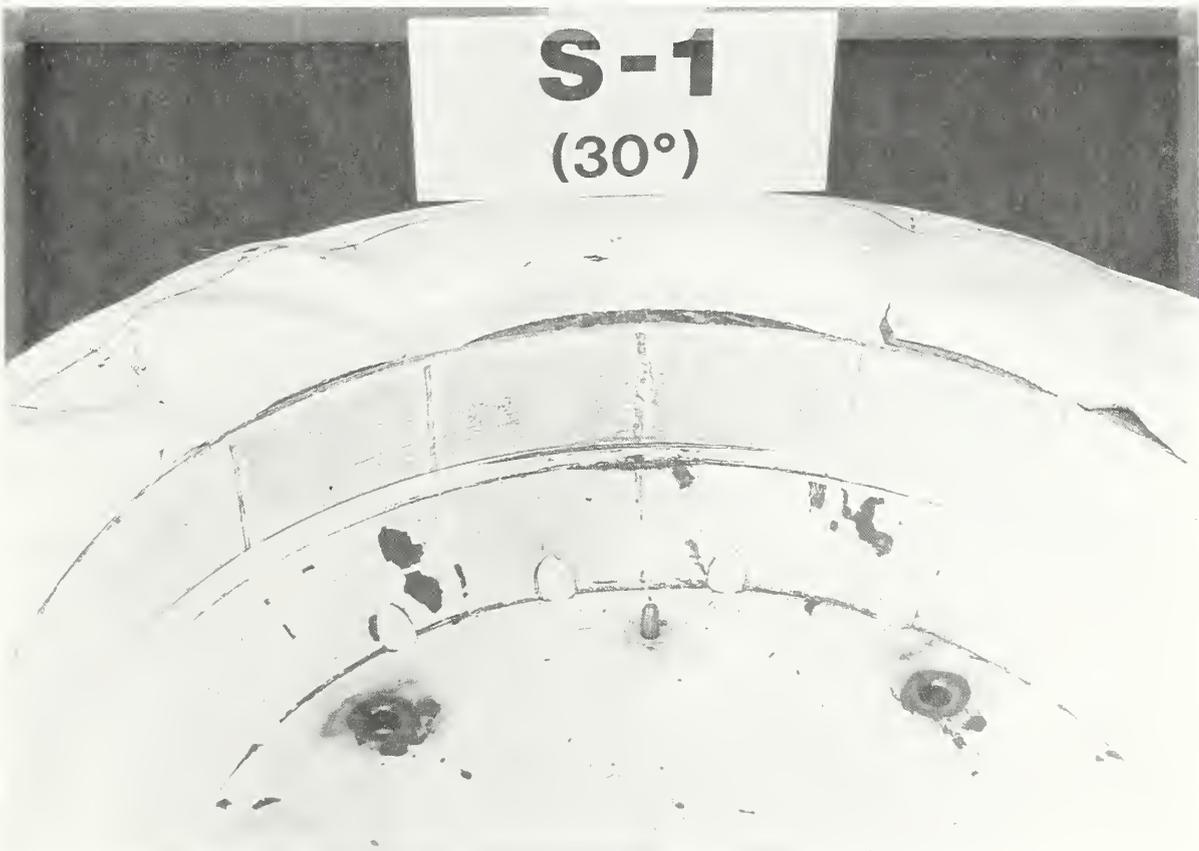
(d) Local Damages, Including Weld Fracture on the Inner Surface of S-1
